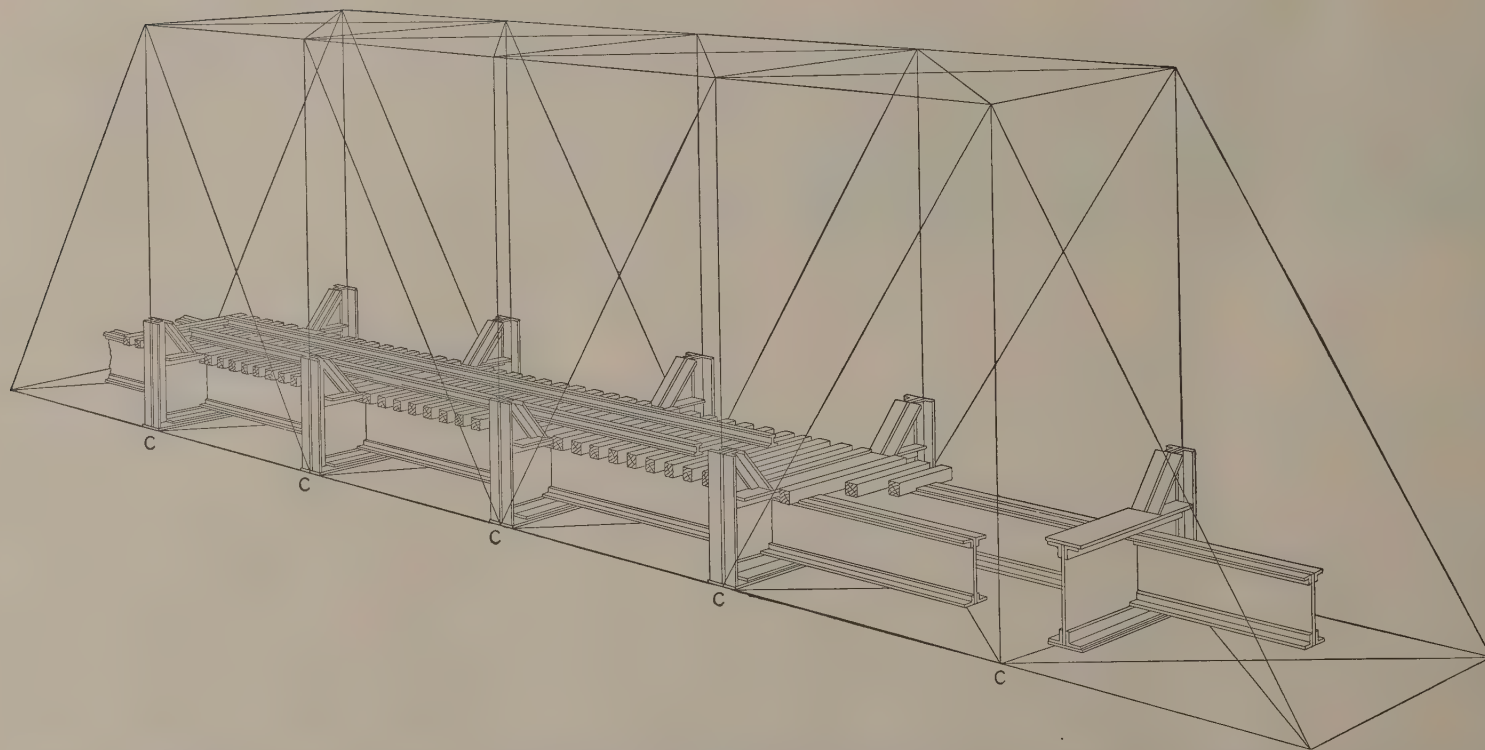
Diagram of a Single-track Through Pratt-truss Railroad Bridge Showing How the Floor System is Connected to the Trusses at Panel Points Only.
